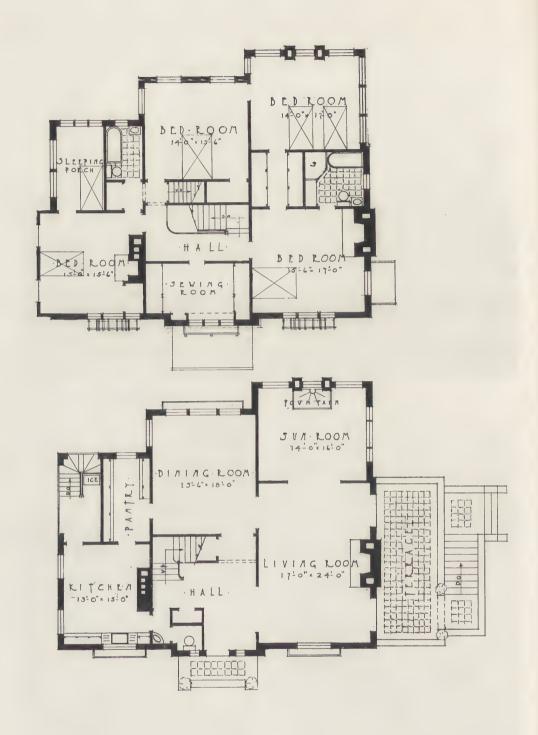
FIRST AND SECOND FLOOR PLANS—HOUSE OF C. S. BISSELL, MILNER HEIGHTS, BIRMINGHAM, ALA. W. L. WELTON, ARCHITECT.
